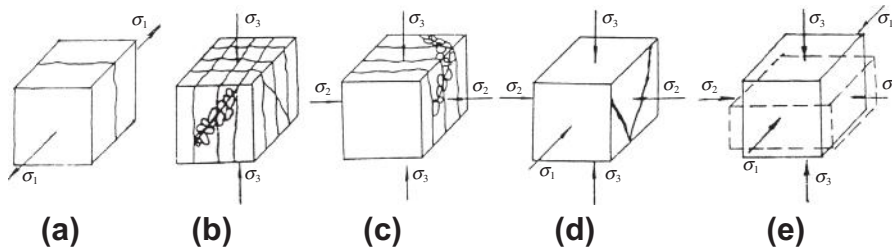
Typical macro-failure patterns of concrete [5-4]: (a) breaking in tension, (b) columnar crushing, (c) splitting in pieces, (d) inclined shearing, (e) extruding and shifting
